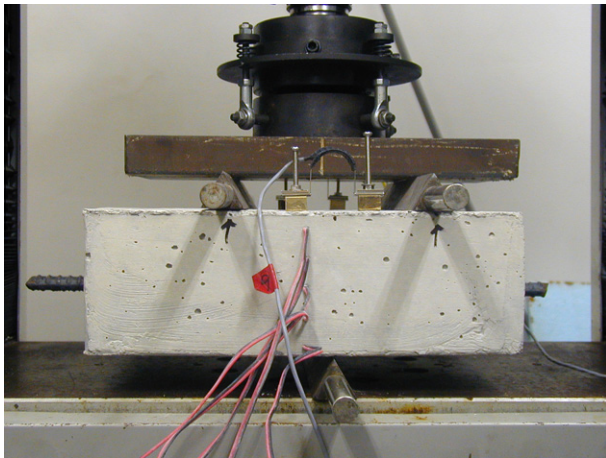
Inducing a bending crack in specimen by three-point flexural loading.
